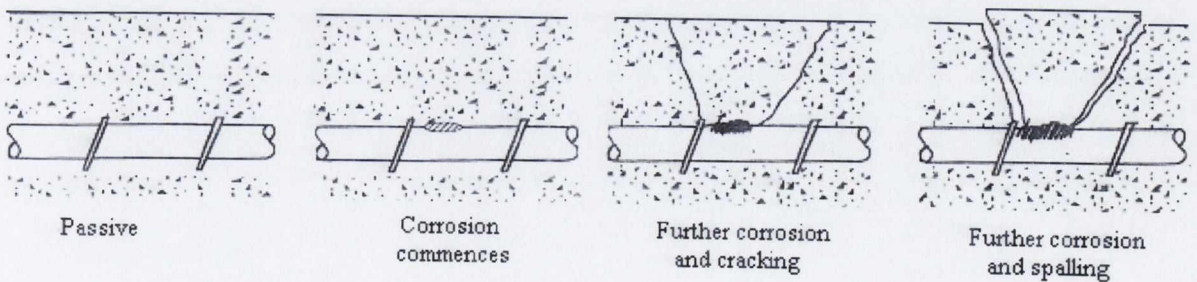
Cracking and spalling of reinforced concrete due to corrosion (Advanced Concrete Technology Lecture F4, 1999)
